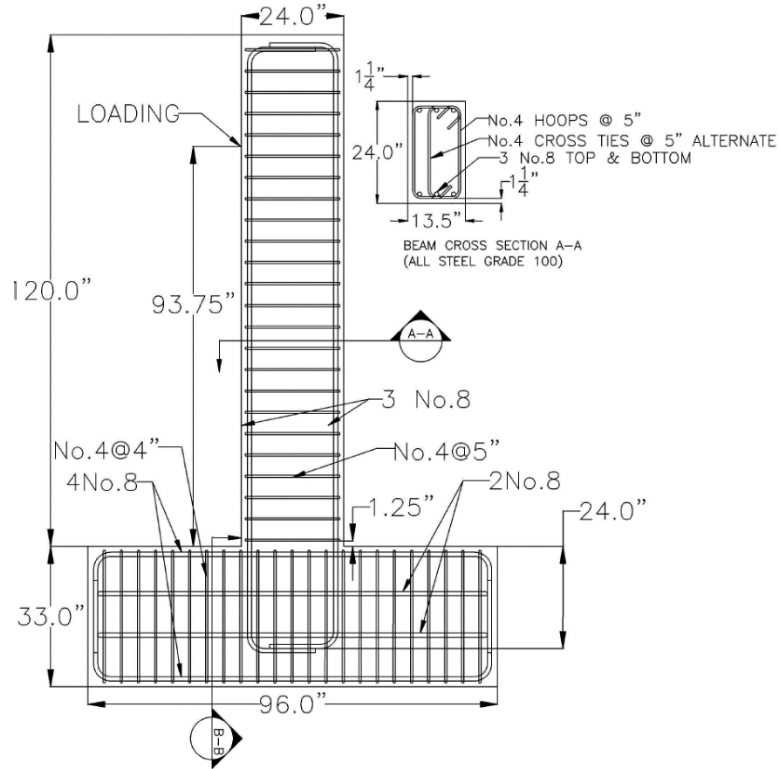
Reinforcement Details for Beams SBL100, SBH100, and SBM100
